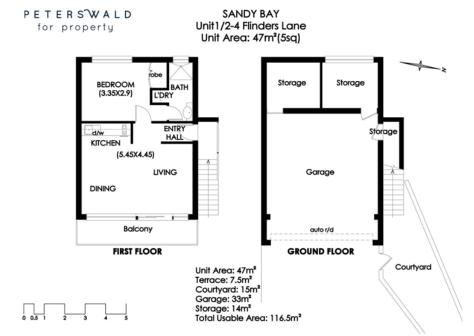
Floor plan of Unit 1 (source: realestate.com, accessed 16 June 2022)
